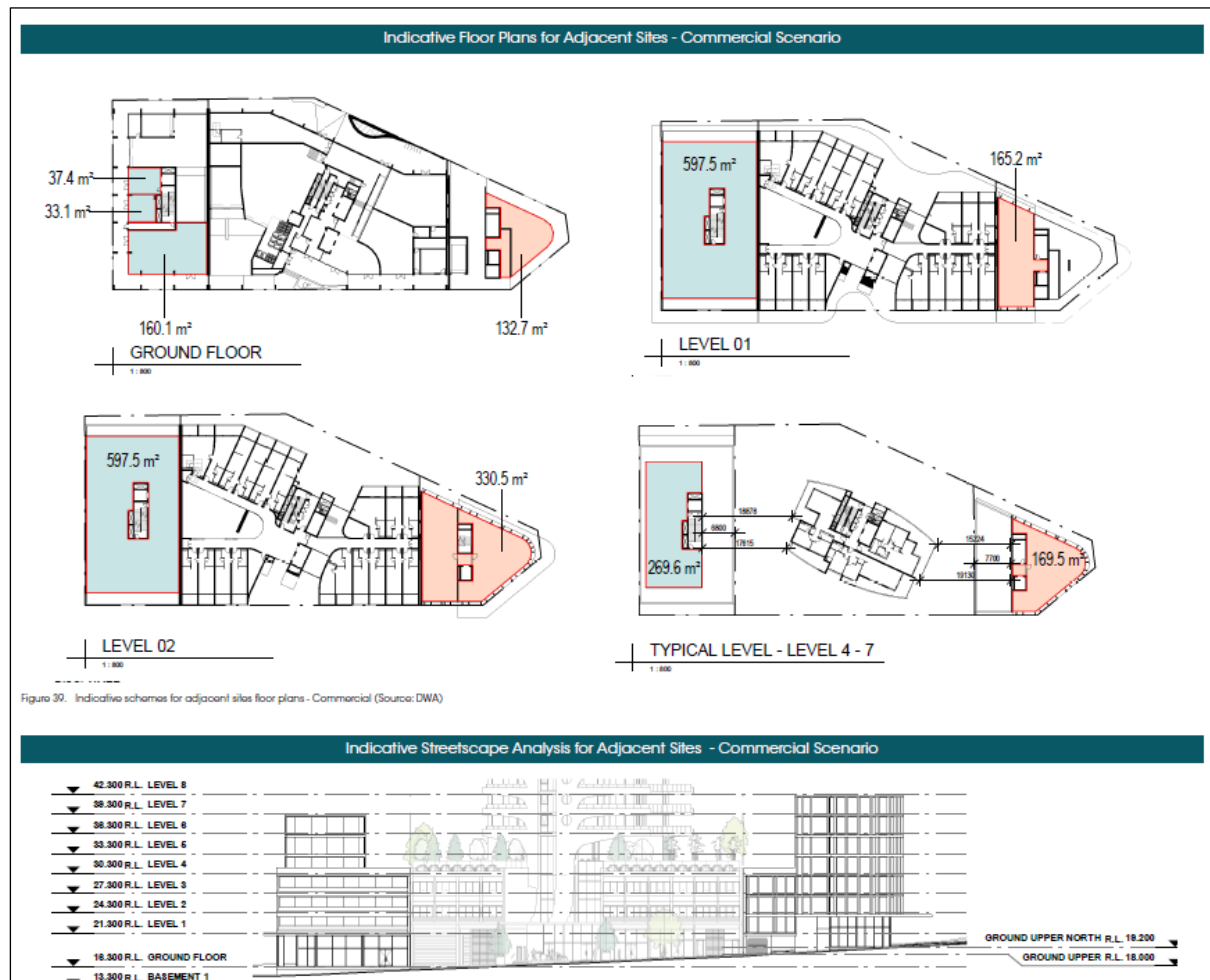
Indicative Floor Plans and Streetscape Analysis - Commercial Development
